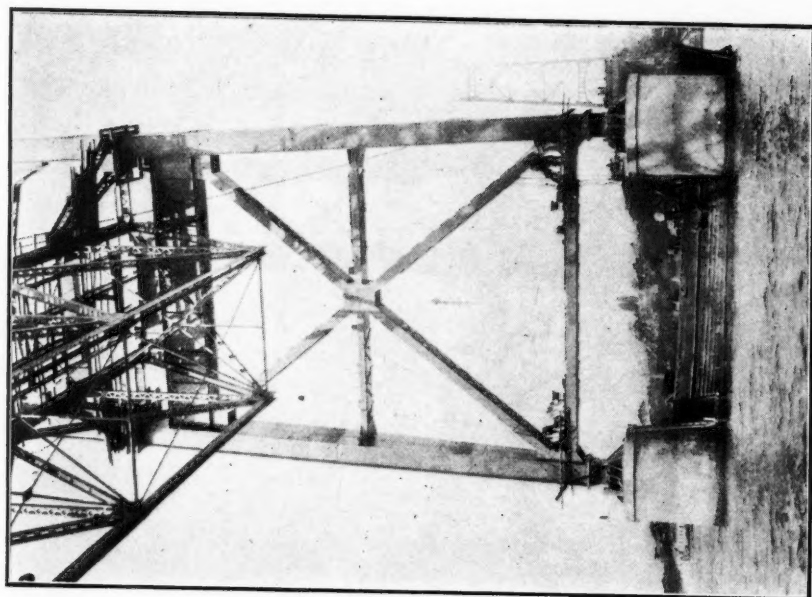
VIEW OF LOWER PART OF CONTINENT TOWER, FLORIANOPOLIS BRIDGE, SHOWING TEMPORARY STRUT CONNECTIONS.
